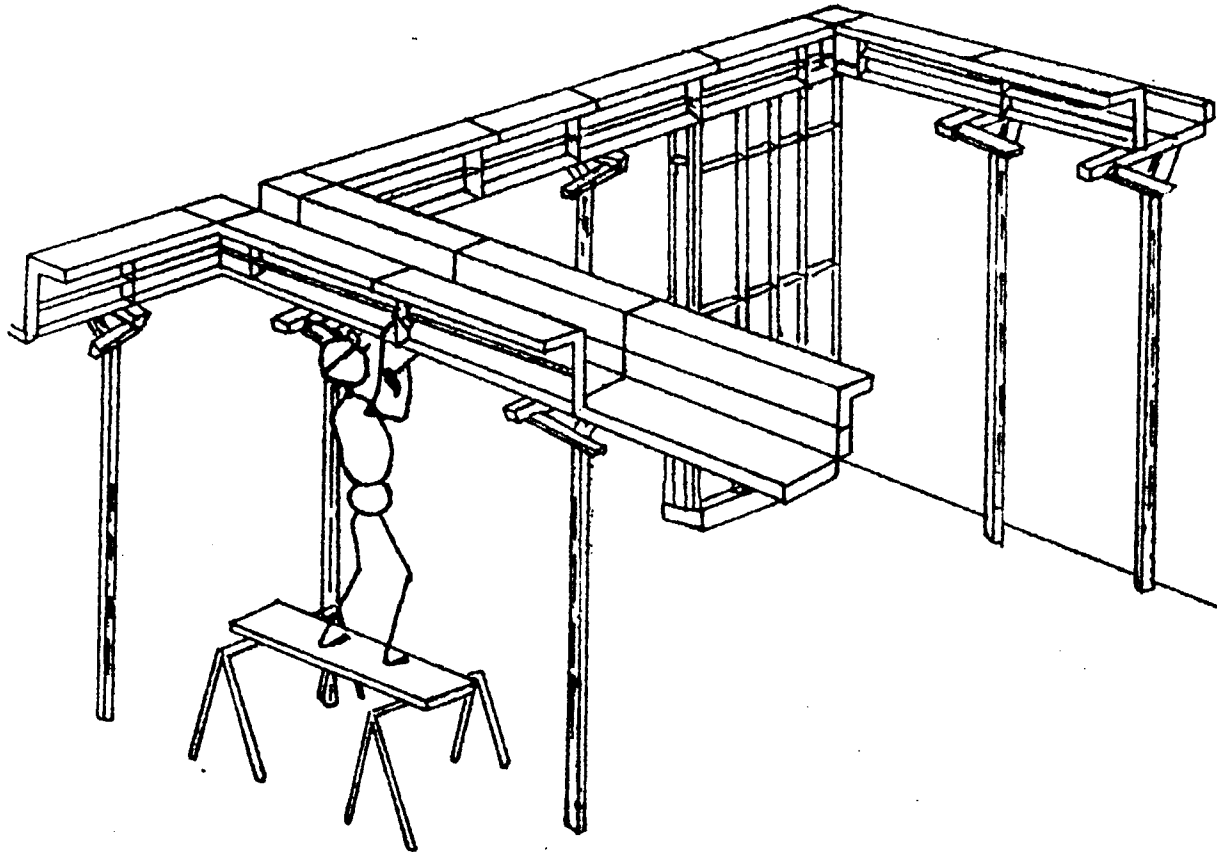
ASSEMBLING OF BEAM SIDE FORMS
